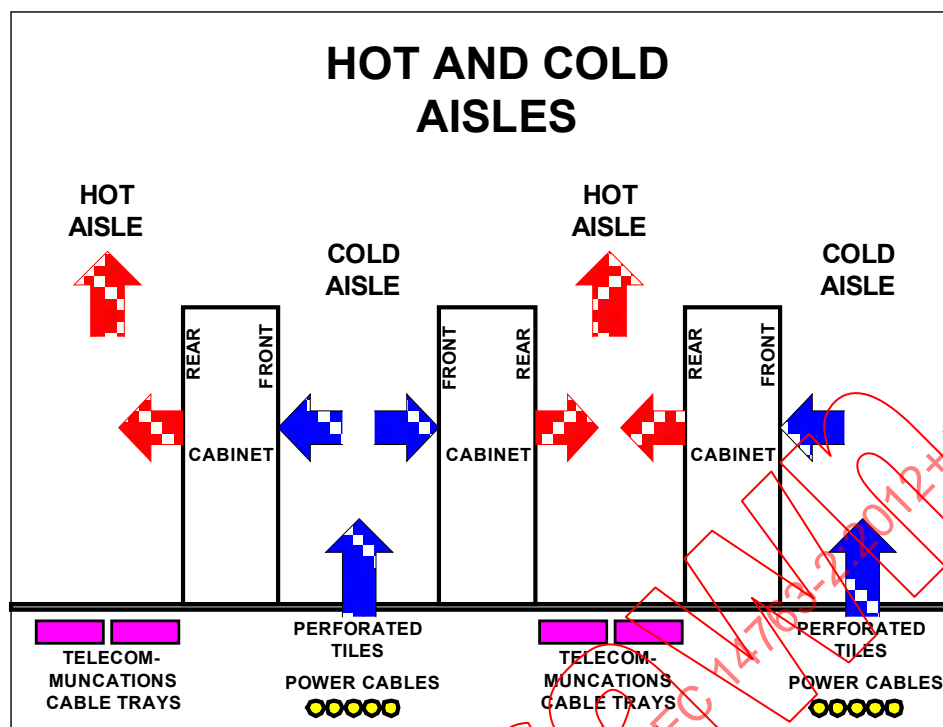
Example of "hot" aisles, "cold" aisles and cable pathway locations
